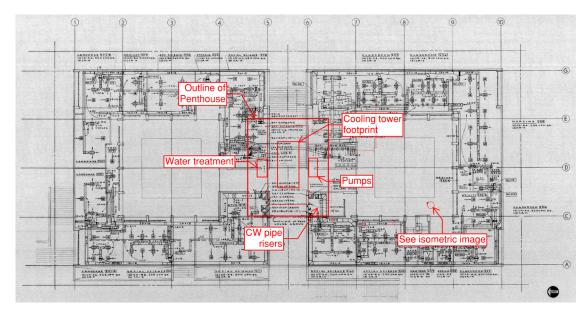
Plan view of potential cooling tower on Building E penthouse roof. Location 1.
